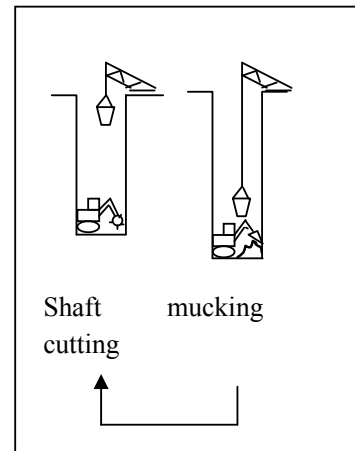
Shaft sinking with a shaft cutting machine (SCM) down the shaft and mucking.
